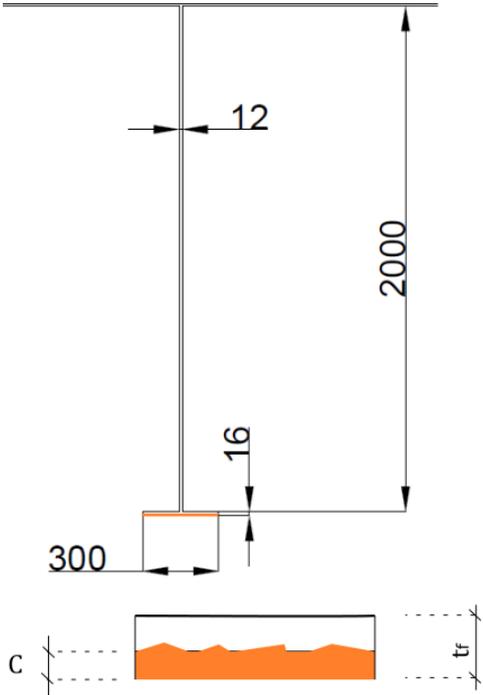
Uniform corrosion of bottom flange main stringer.
